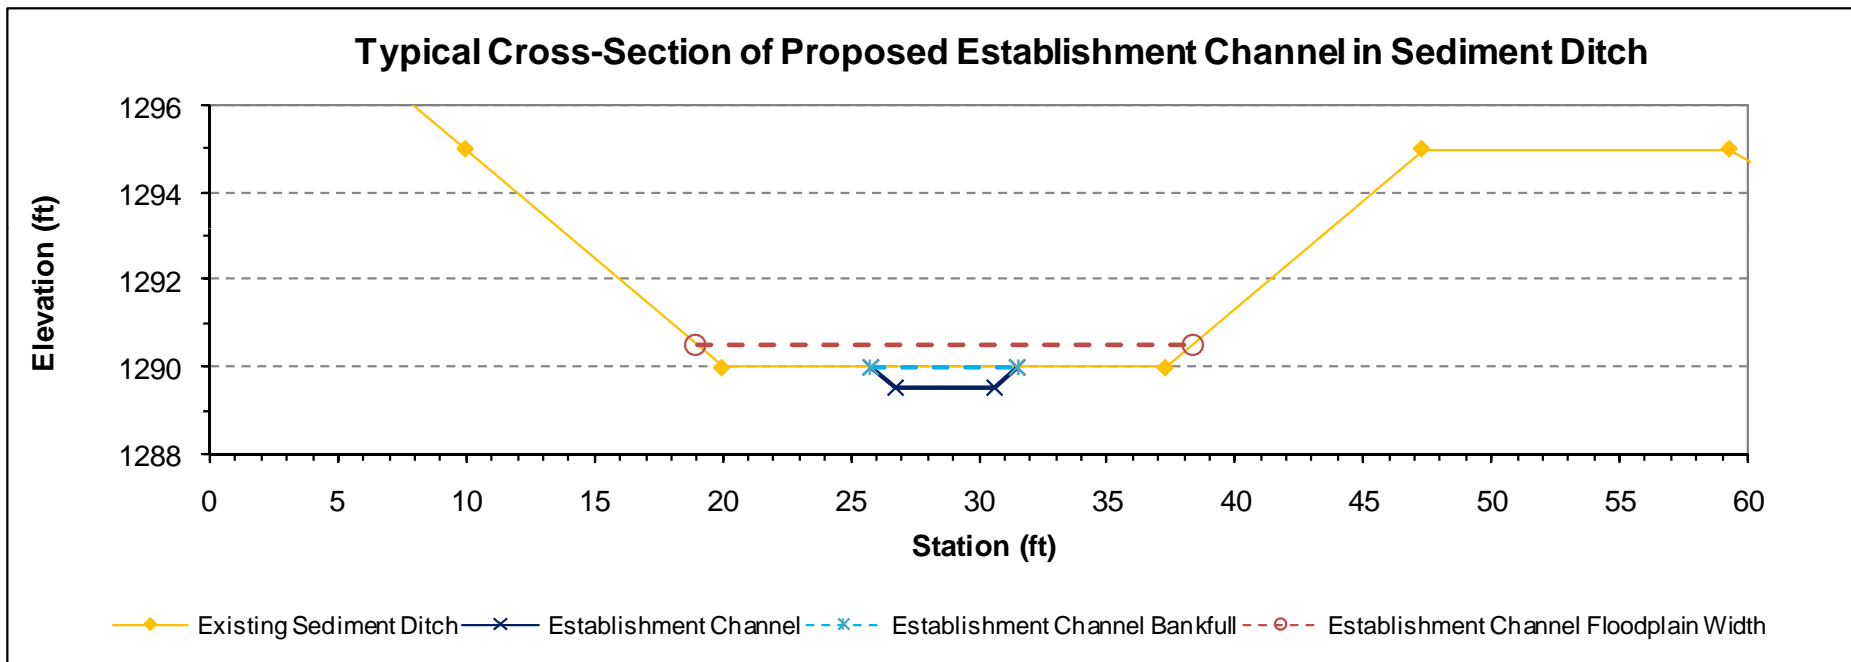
Typical Cross-Section of Proposed Establishment Channel in Sediment Ditch
